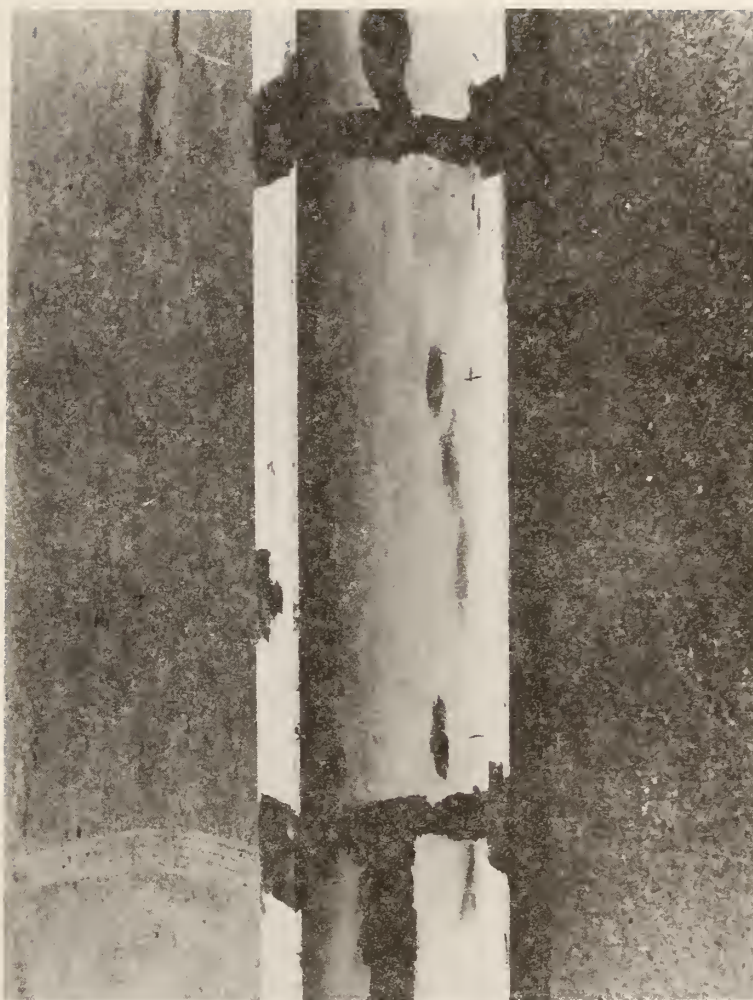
Fatigue cracks in compression flange (top) and tension flange (bottom) for A514 steel welded beam.
